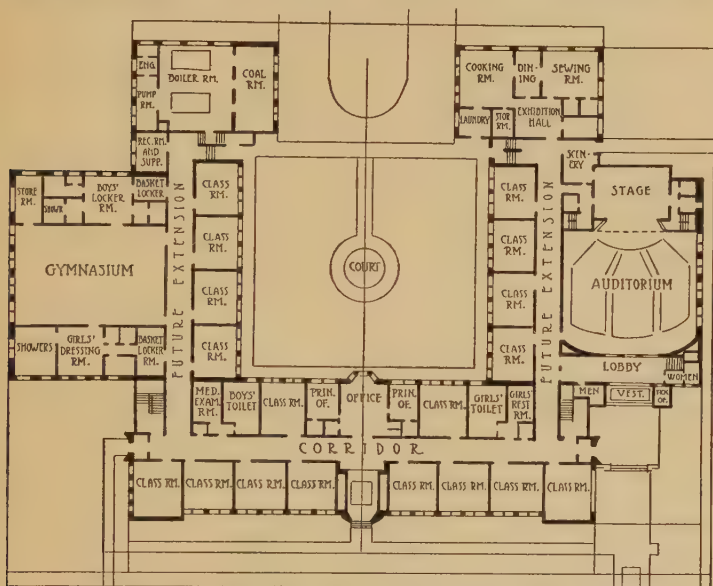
First-floor plan, Roosevelt Junior High School, Appleton, Wisconsin
